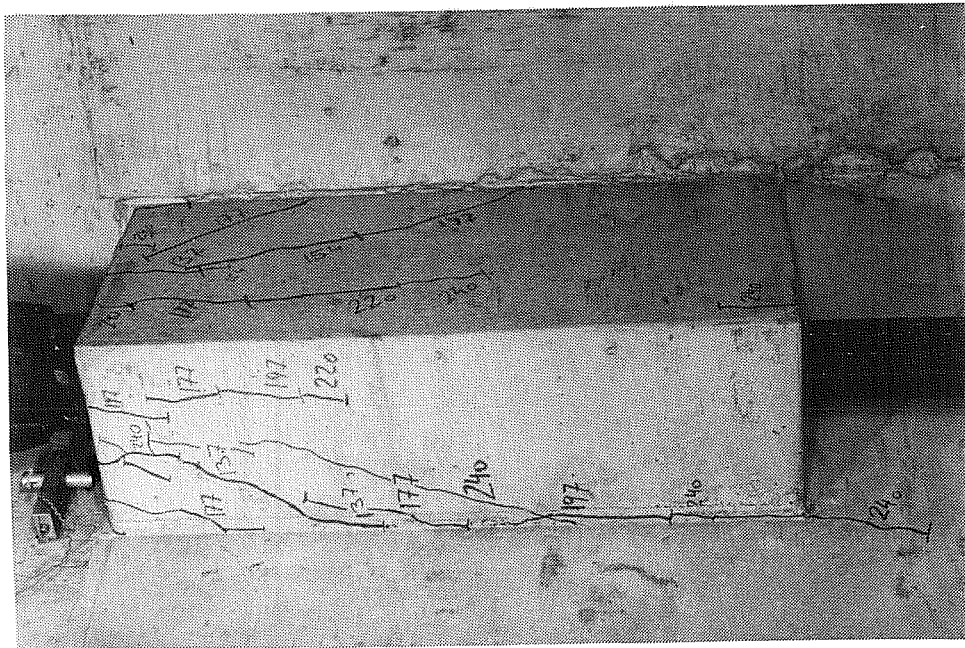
Crack Development In Specimen Corner3 at 94% of Failure Load
